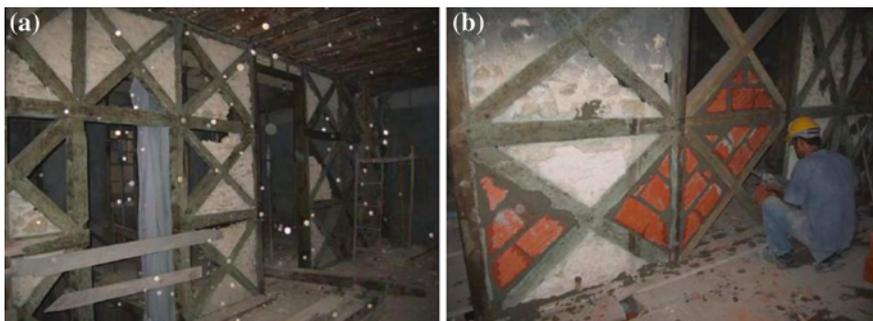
a *Frontal* walls with the original filling and b damaged panels filled with hollow bricks with hydraulic and cement mortar
